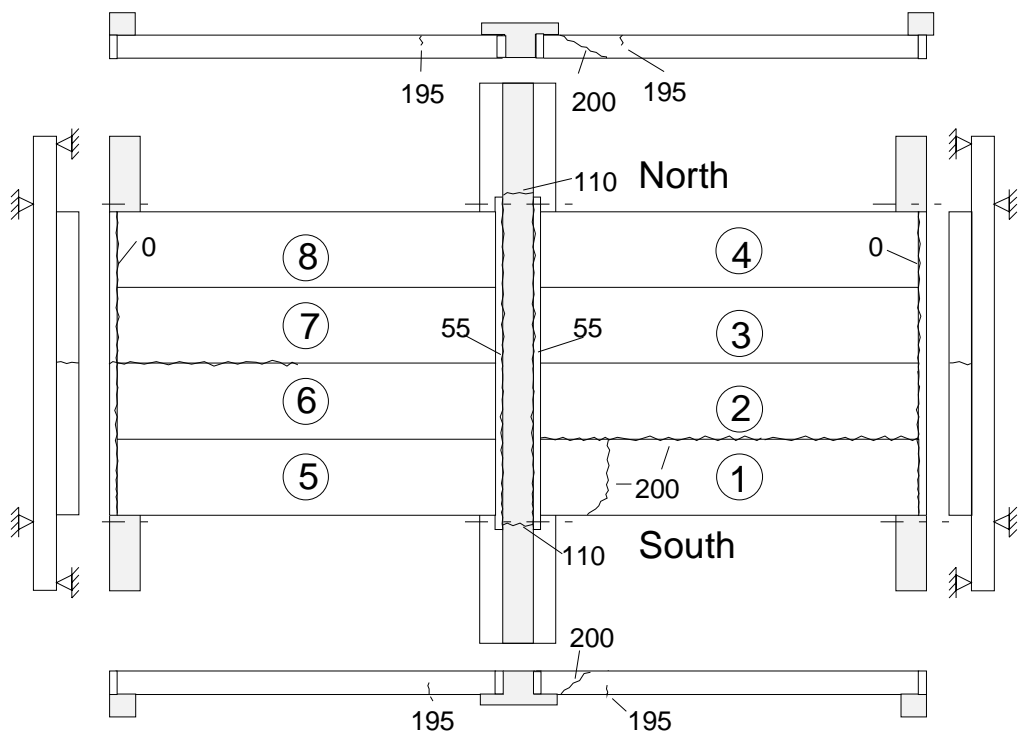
Cracks after failure on the top and at the edges of the floor specimen. The numbers refer to the actuator loads P_1 .
